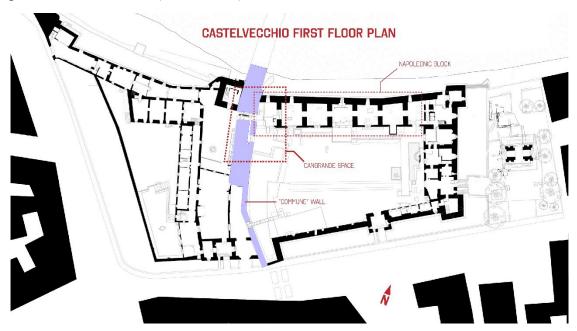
Castelvecchio First Floor Plan. Picture Credit: Base Plan From Filippo Bricolo & Bricolo Falsarella Associates
